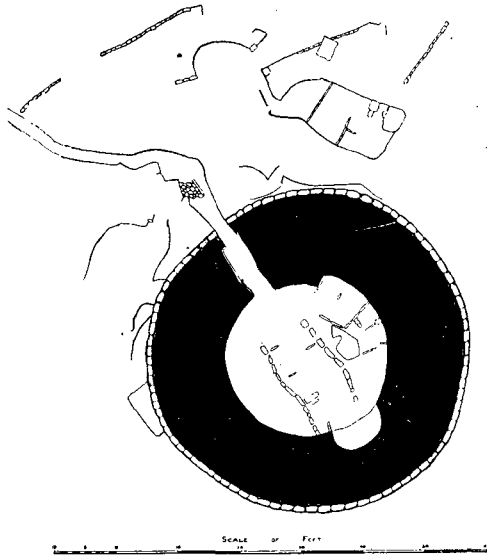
Ground Plan of Broch at the White Gate, and its outbuildings.
